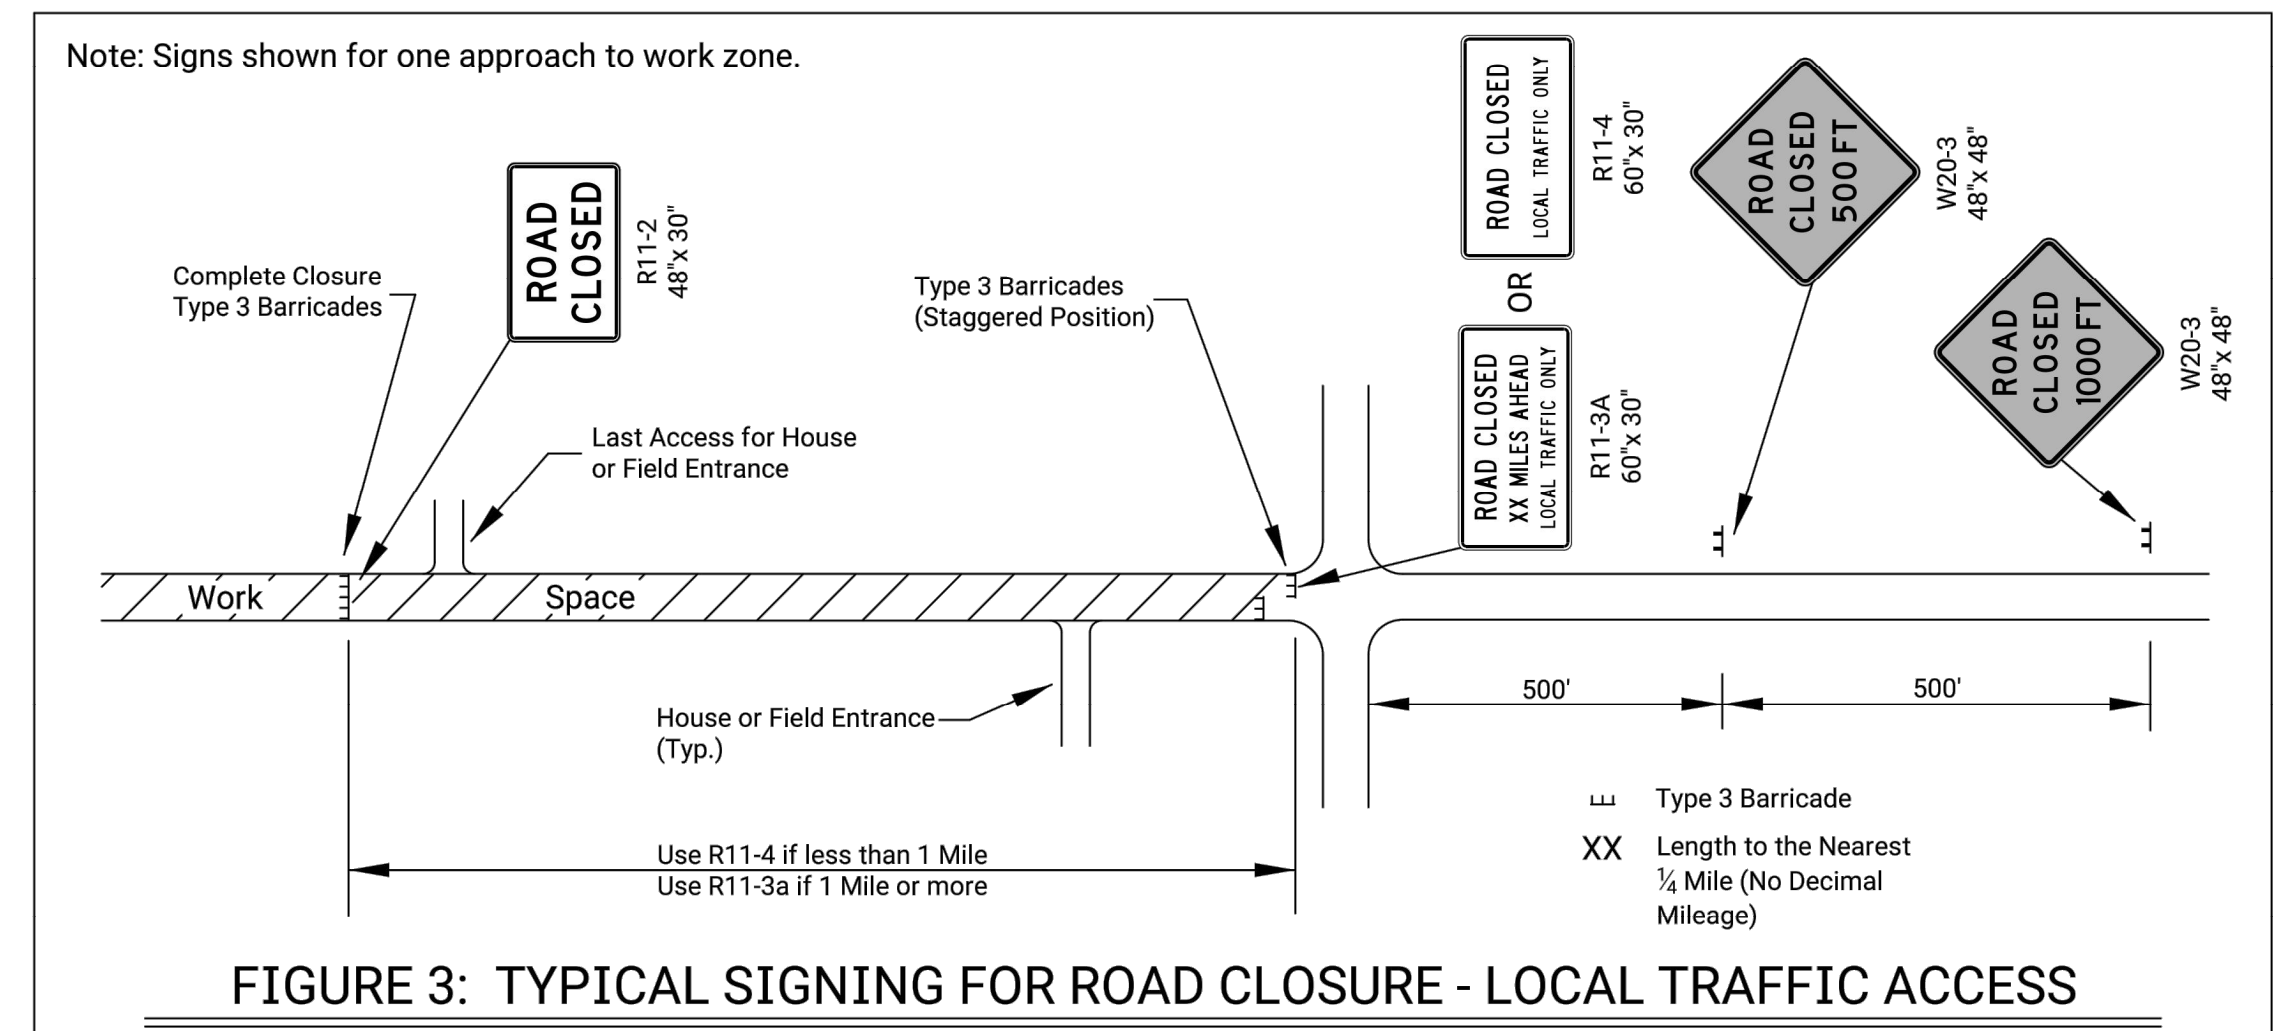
TYPICAL SIGNING FOR ROAD CLOSURE - LOCAL TRAFFIC ACCESS
